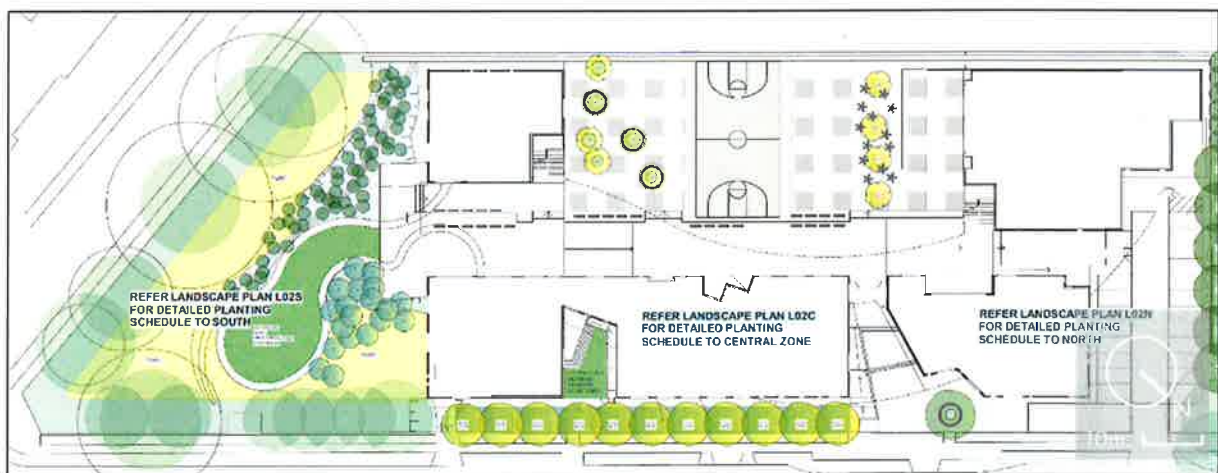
| Landscape plan (Source: Applicant's EIS 2018).
